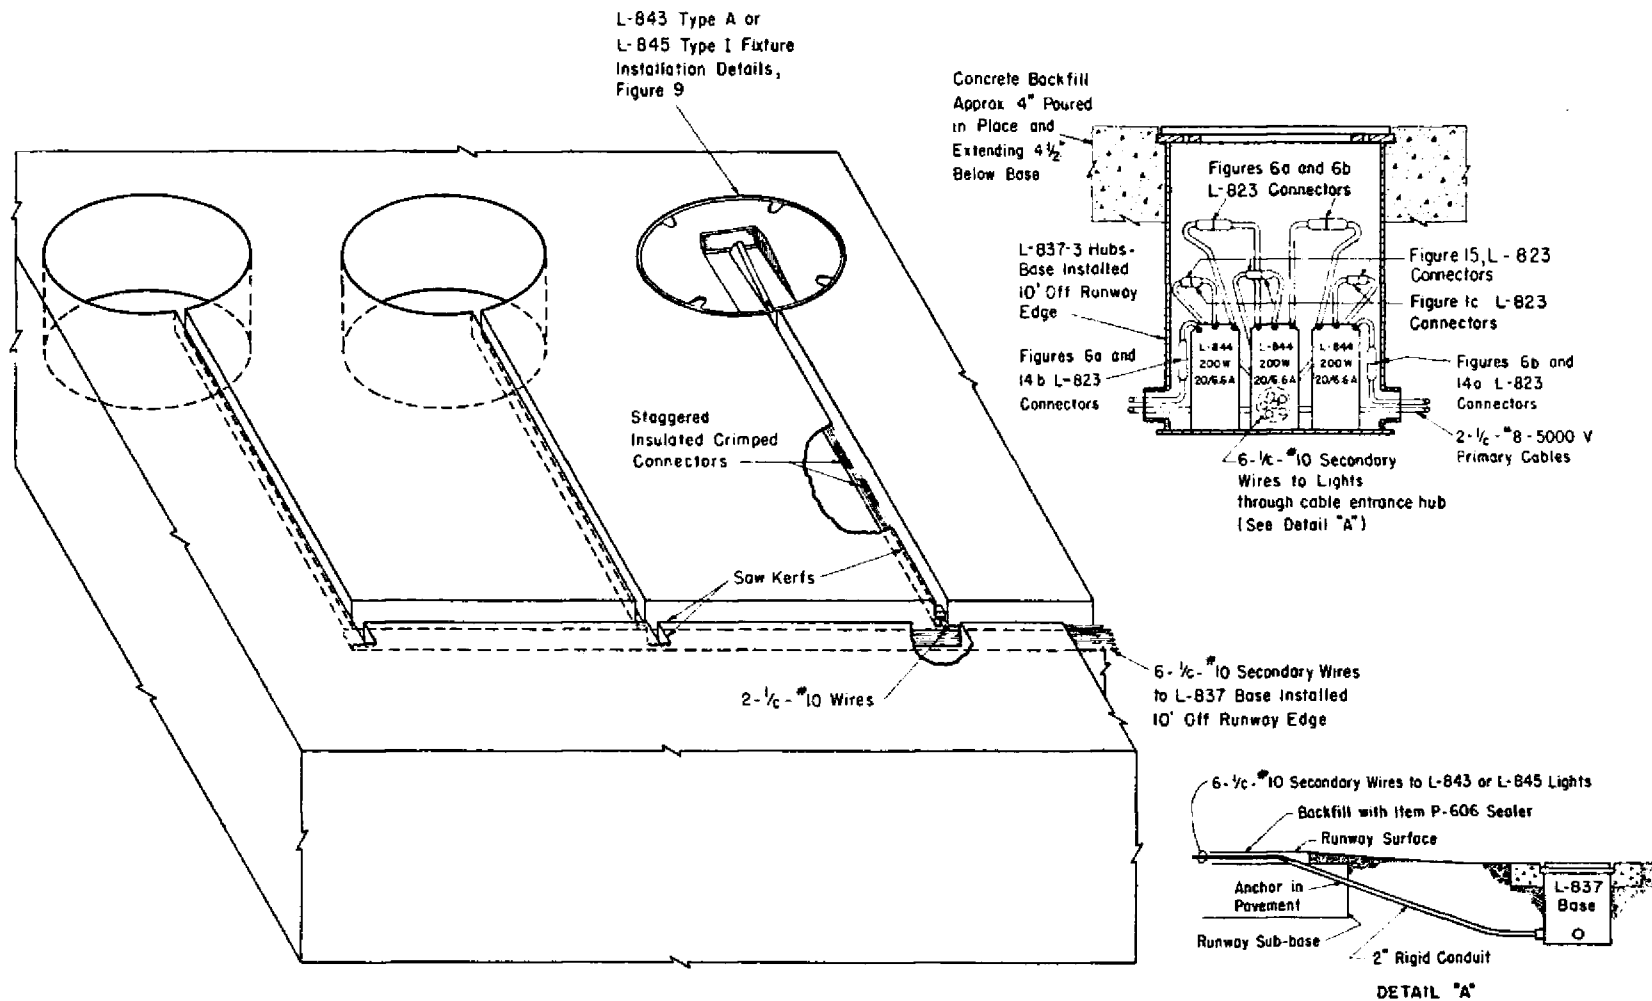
TYPICAL INSET TOUCHDOWN ZONE LIGHT EQUIPMENT LAYOUT
